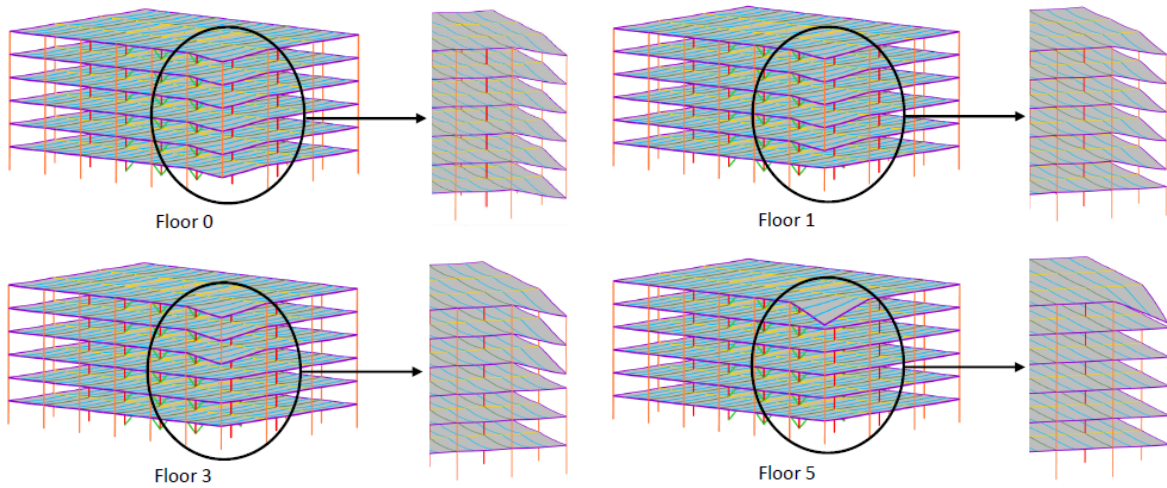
Global view of the structure - Losing corner column C1 (Rigid connection).
